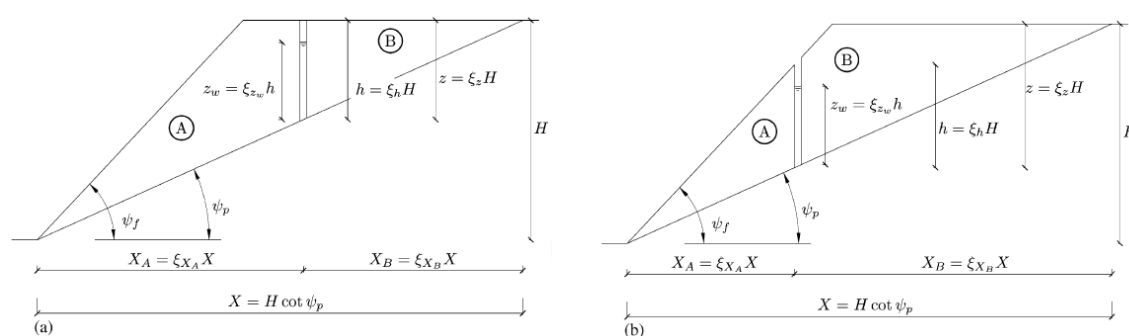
Geometrical definitions of the considered slope stability model (after Rodriguez, 2006). (a) tension crack at slope top; (b) tension crack at slope face
